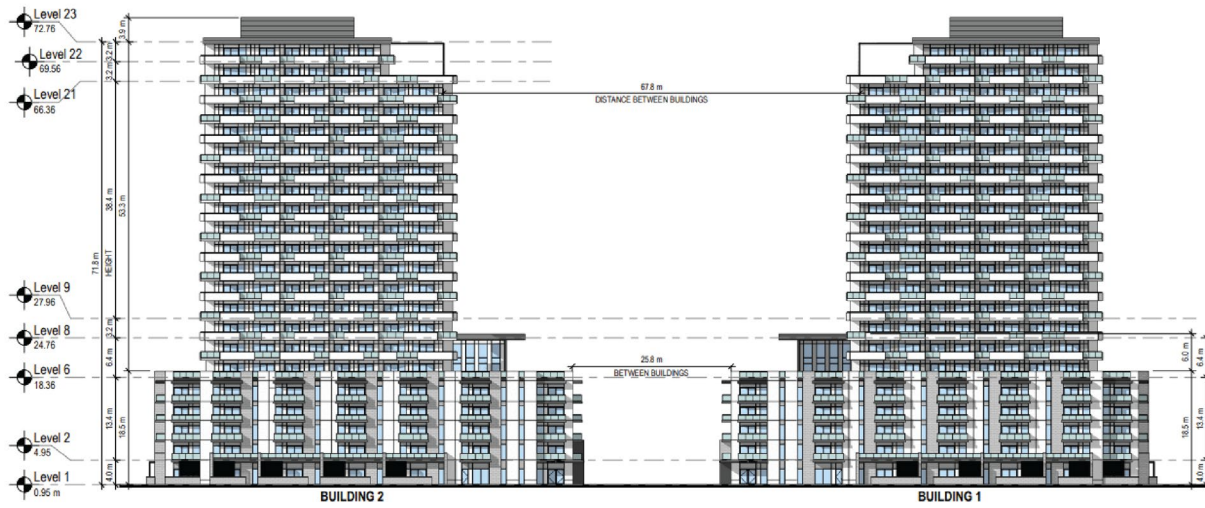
Interior side elevation, facing the central courtyard and cul-de-sac driveway
